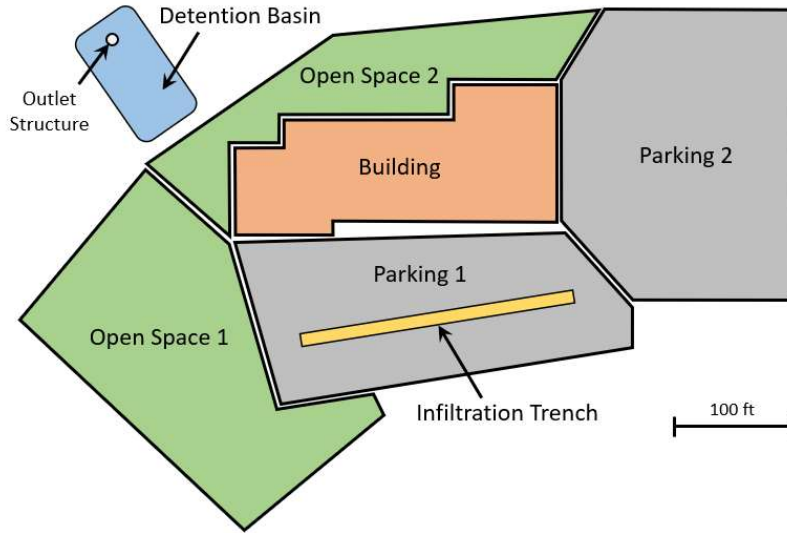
Post-development site design for a case study site in Lee County, AL
